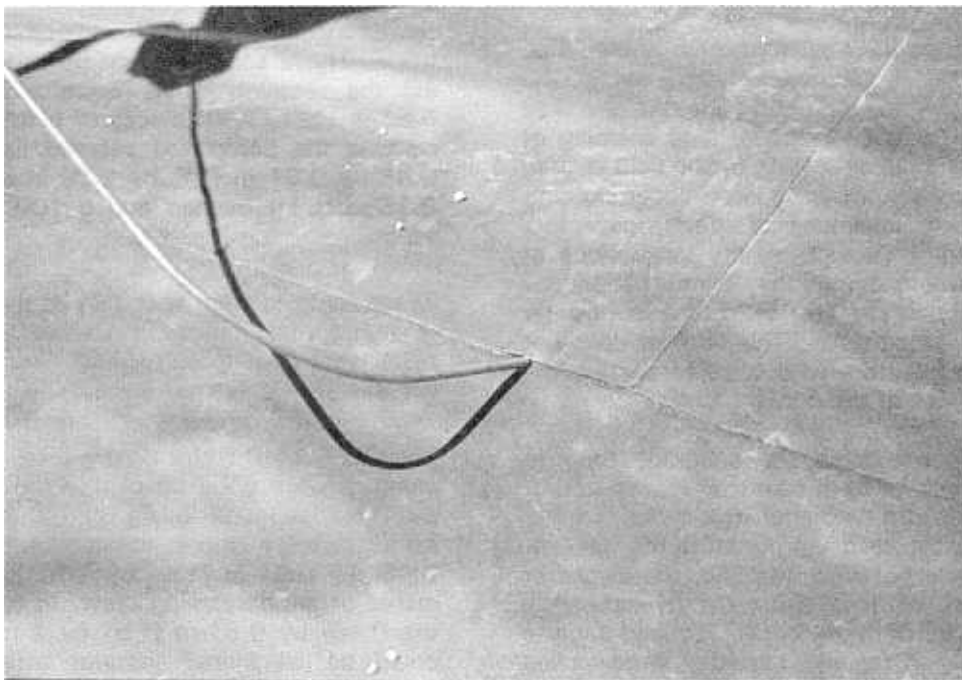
Air test showing defective, unbonded section of overlap seam. Photo P-801-D-79747
